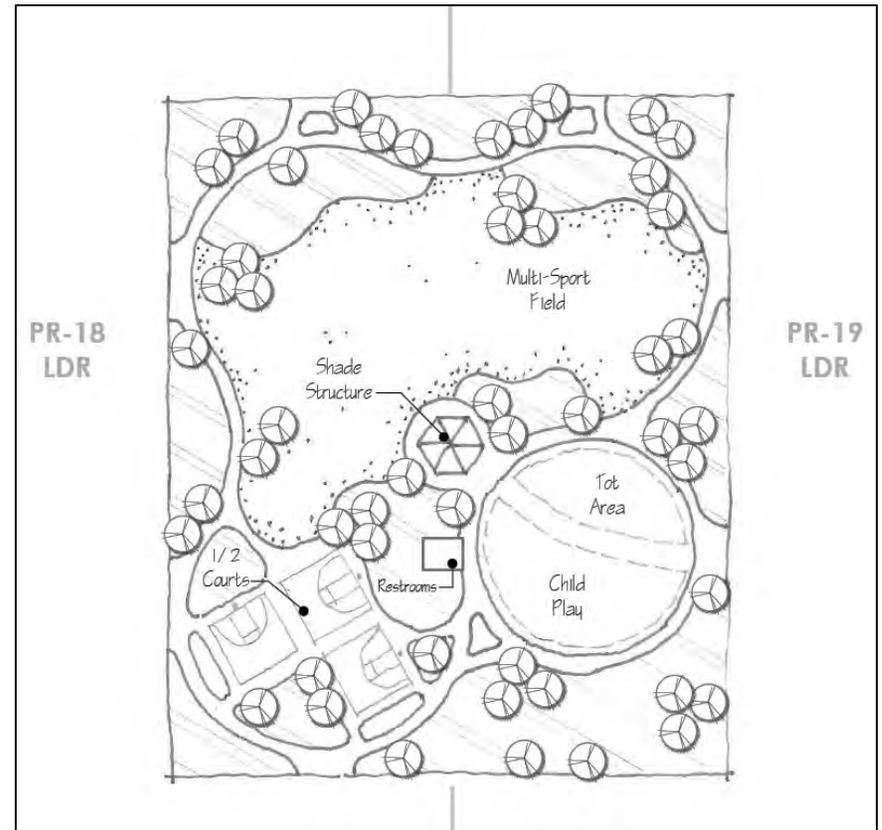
CONCEPT PLAN FOR PARK SITE PR-103
